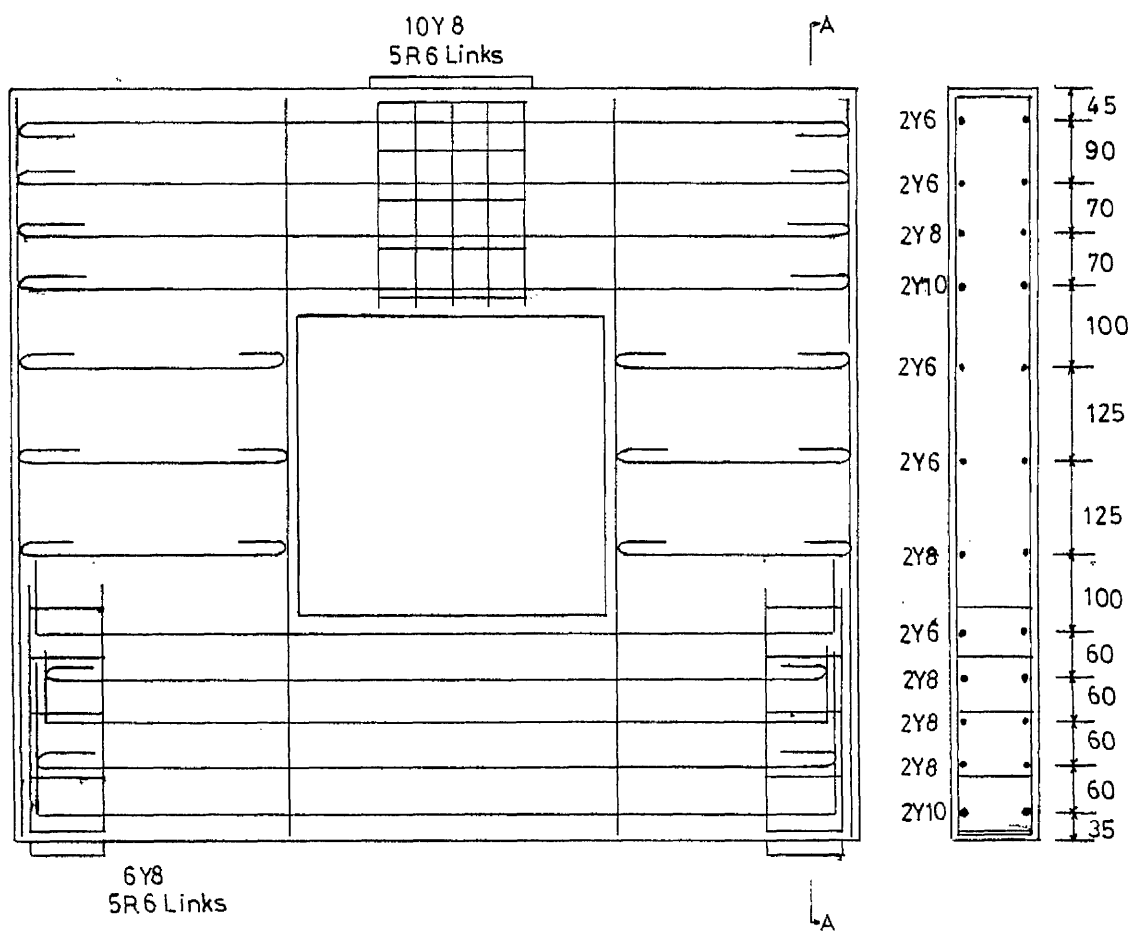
ARRANGEMENT OF REINFORCEMENT FOR BEAM B1. SECTION A-A.
